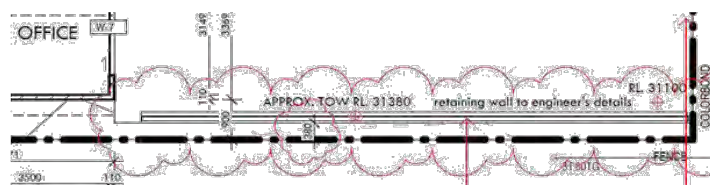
Proposed retaining wall setback refused under DA-2017/216/A (Modification application)
